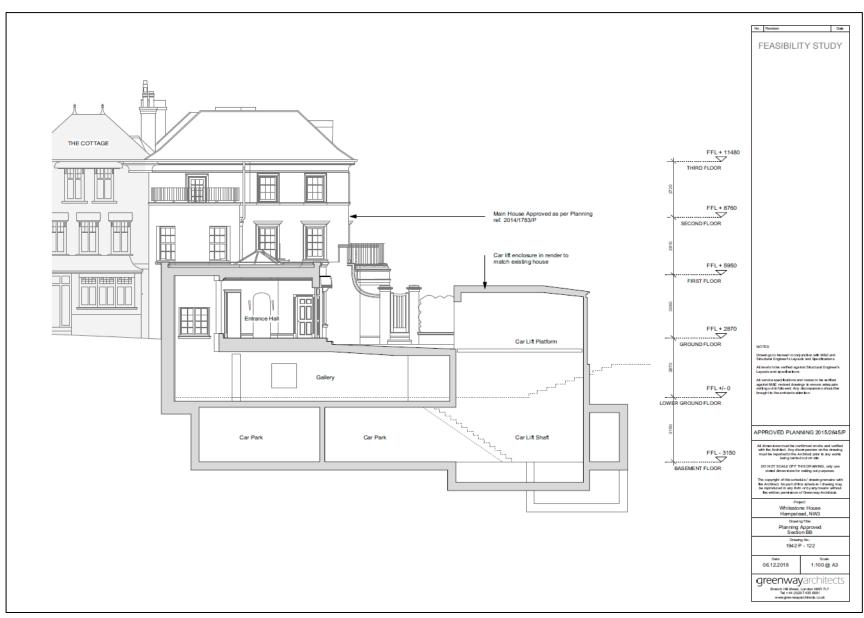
PROPOSED ARCHITECT PLANS FOR WHITESTONE HOUSE, LONDON
